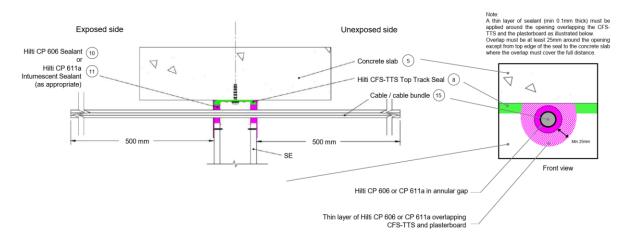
Single cable or cable bundle passing through CFS-TTS without sealant coning.
